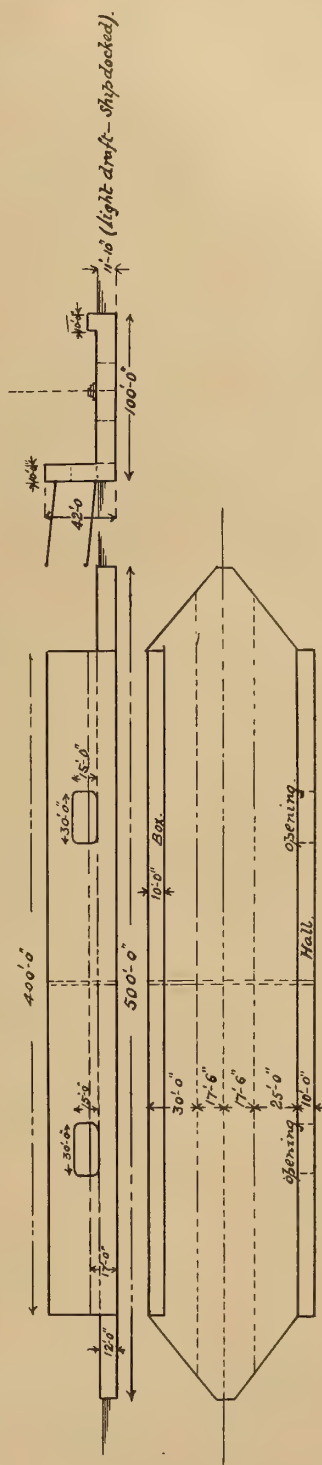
ELEVATION, PLAN AND SECTION OF SINGLE-WALLED OR L-SHAPED DOCK
